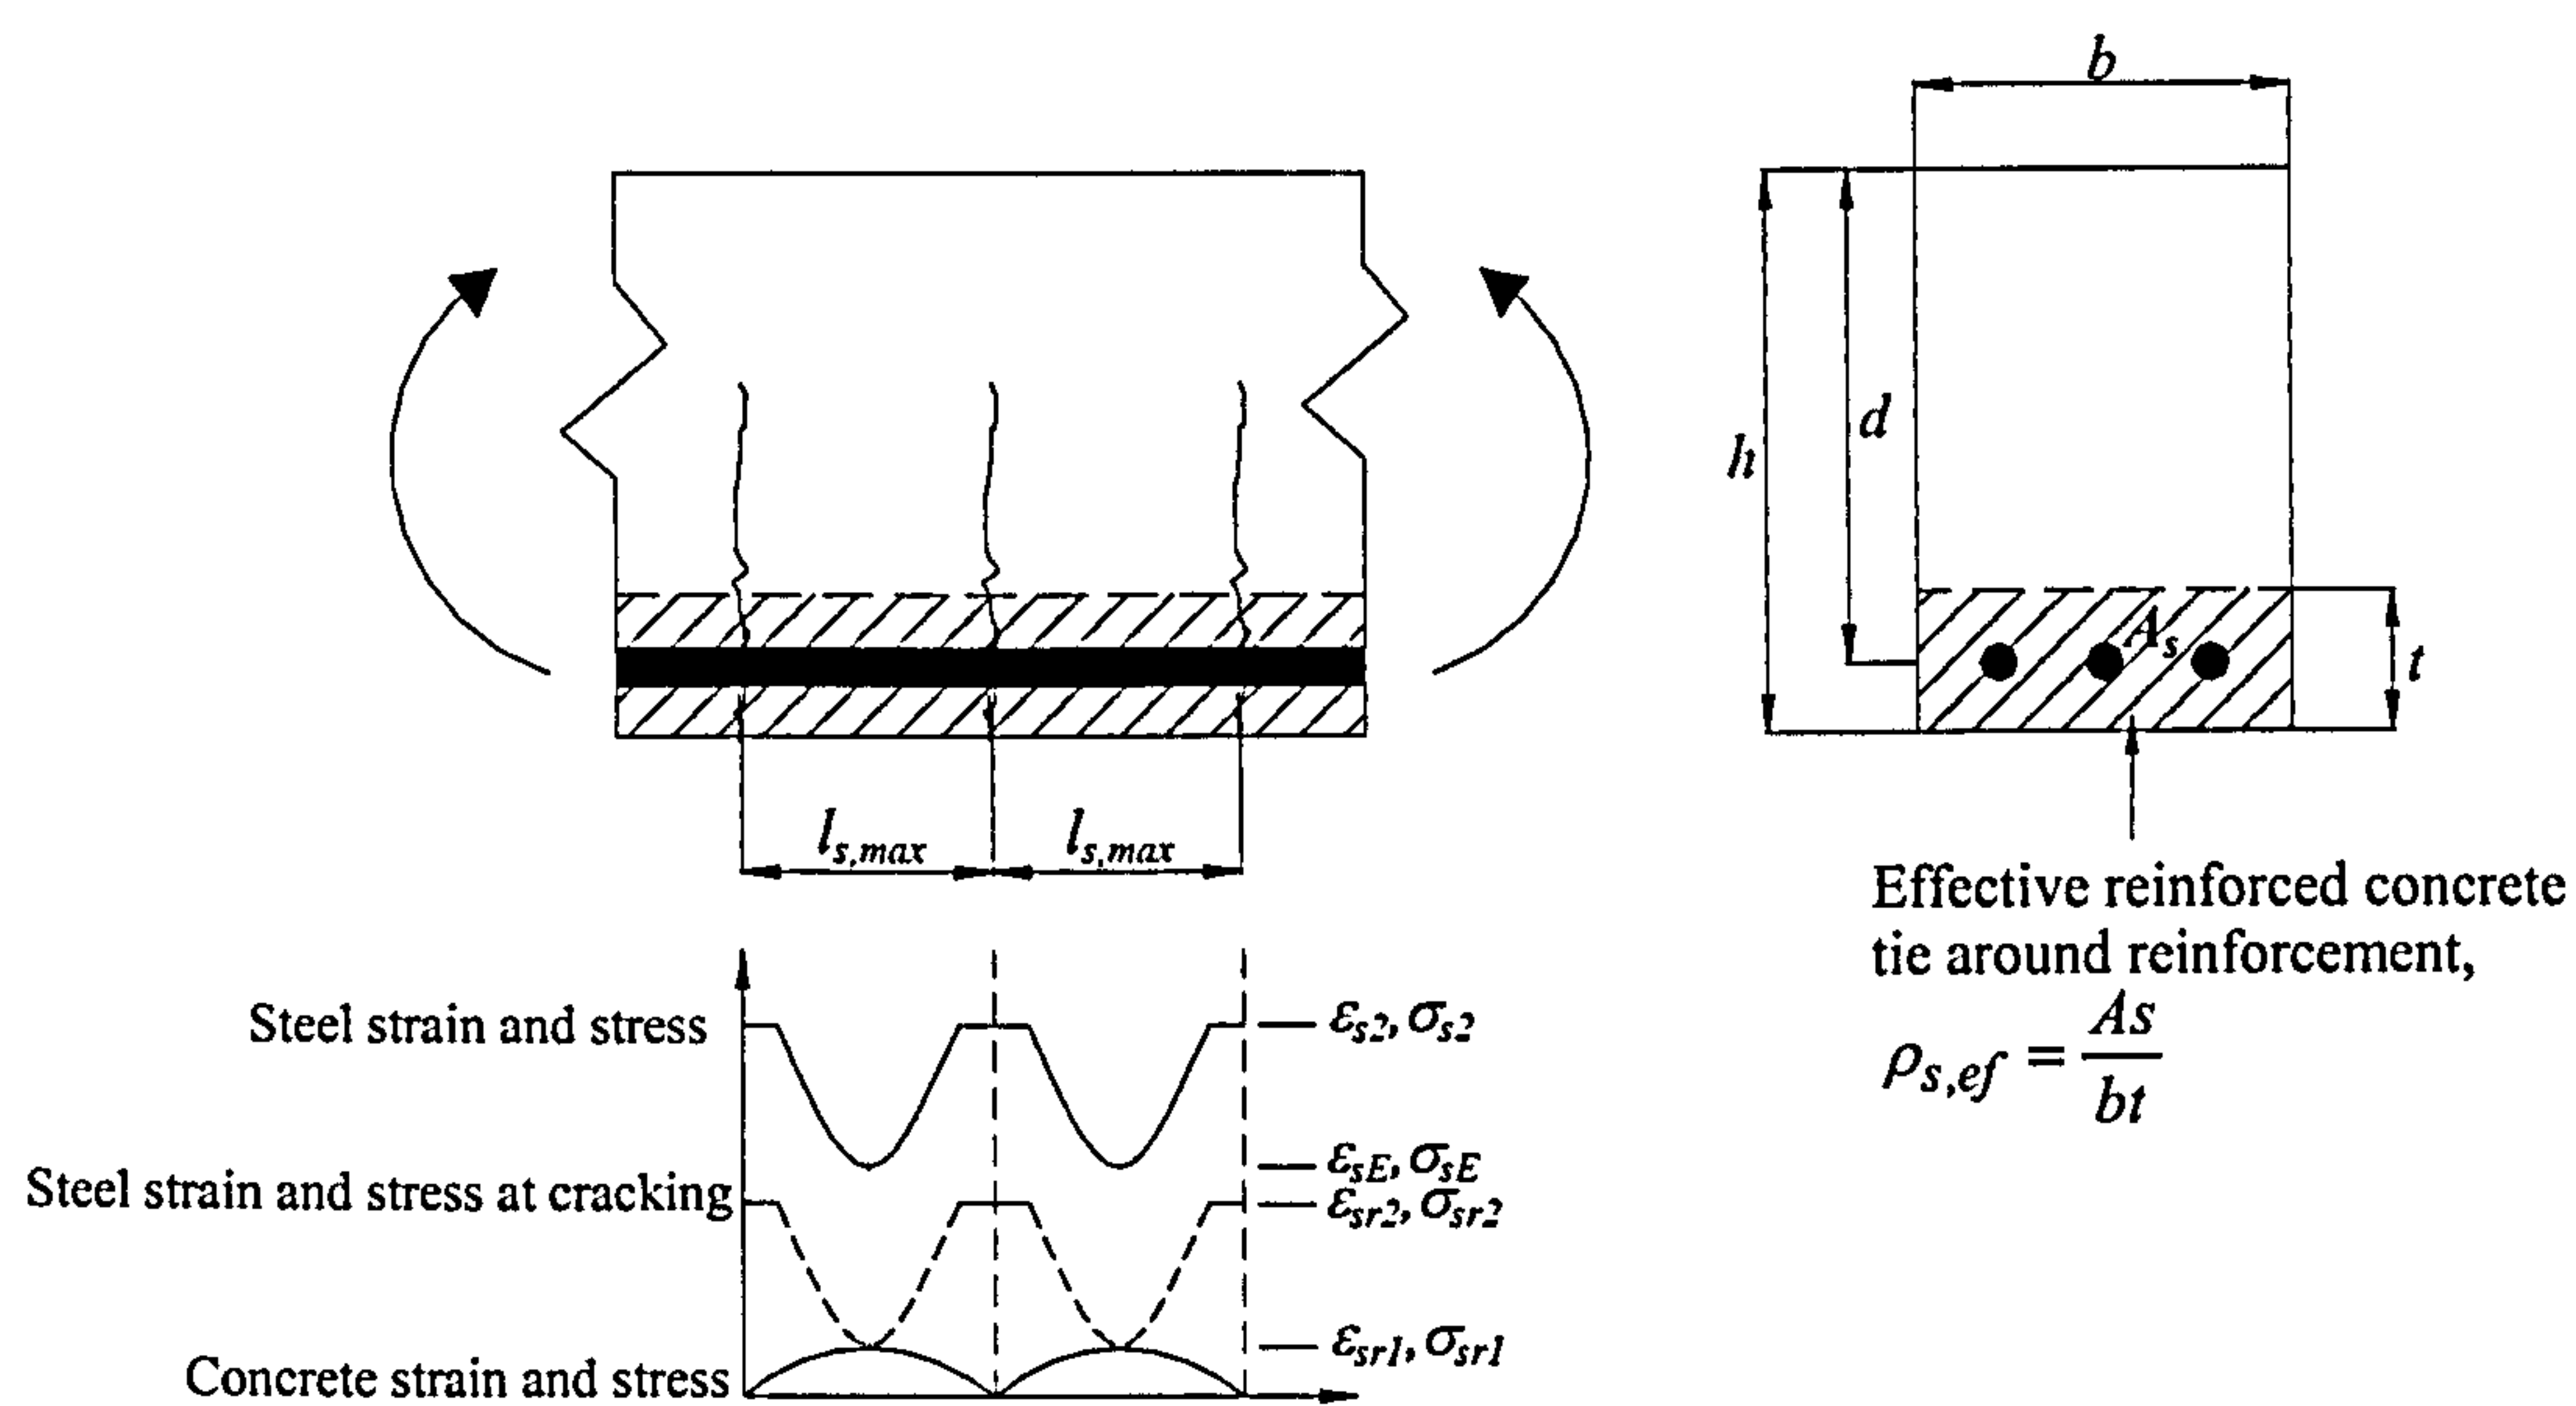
Crack spacing, strain and stress distributions and effective reinforced concrete tie according to CEB (1993).
